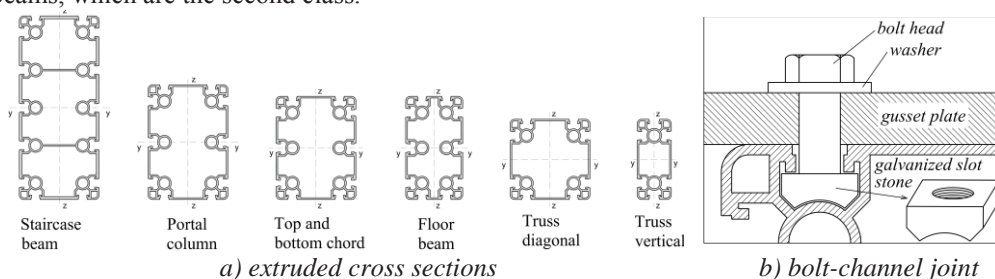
Member cross-sections and a connection detail of aluminum alloy profiles
